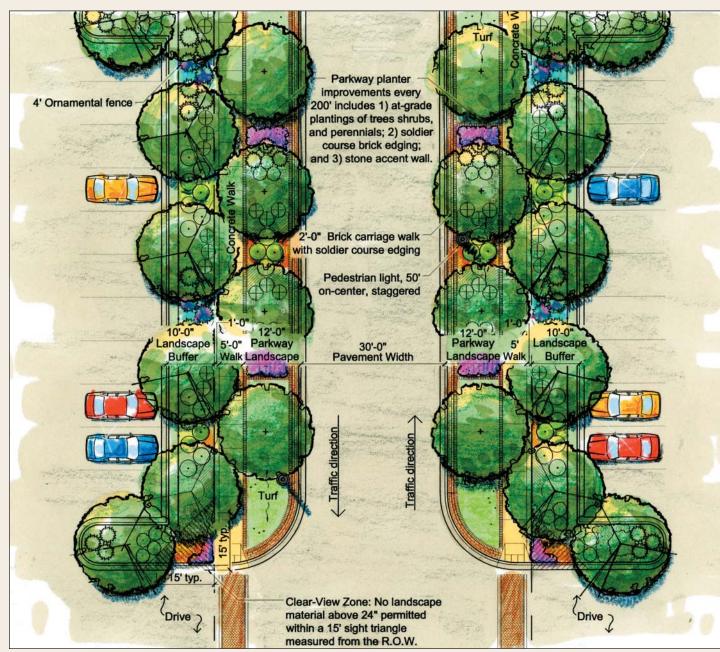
Streetscape Design Plan, Type I illustrates streetsape materials and their locations. Type I streets have a pavement width of 30'-0".
